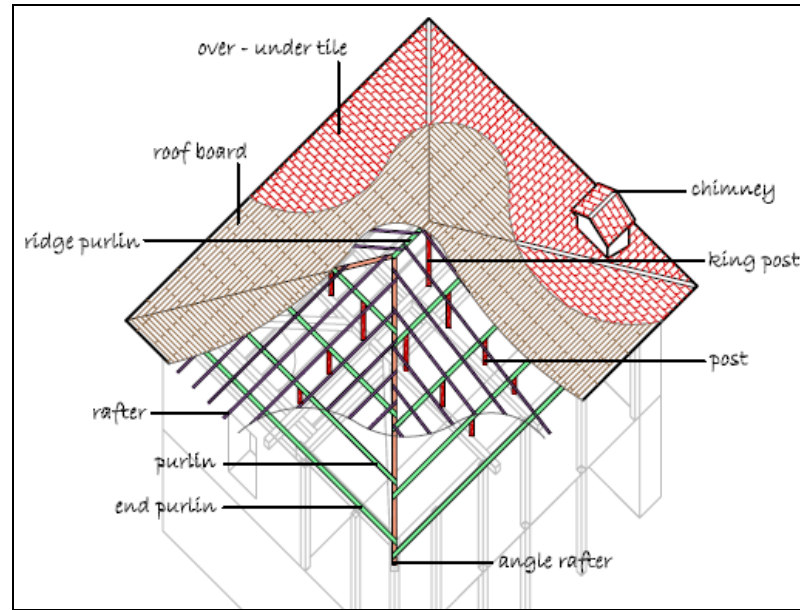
, Example of hipped roof (Camikebir Quarter Gül Street No: 15)
